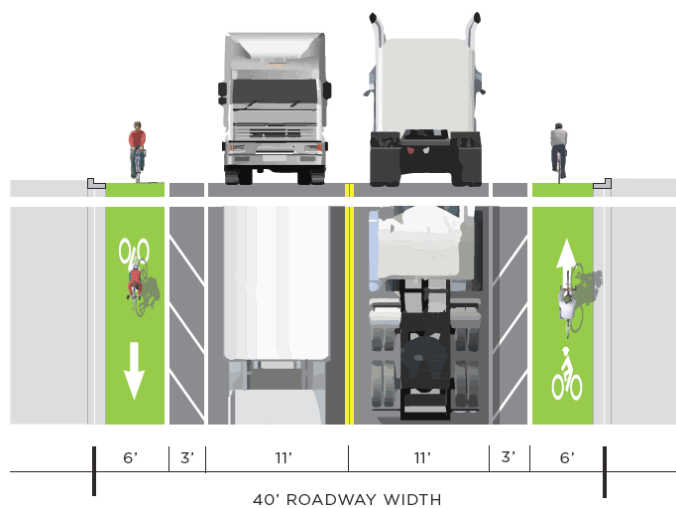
Vernon Avenue between Santa Fe Avenue and Downey Road
